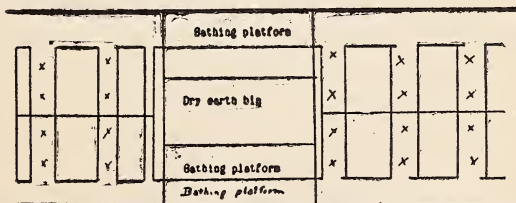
GROUND PLAN OF A TWELVE SEATED STANDING LATRINE.
